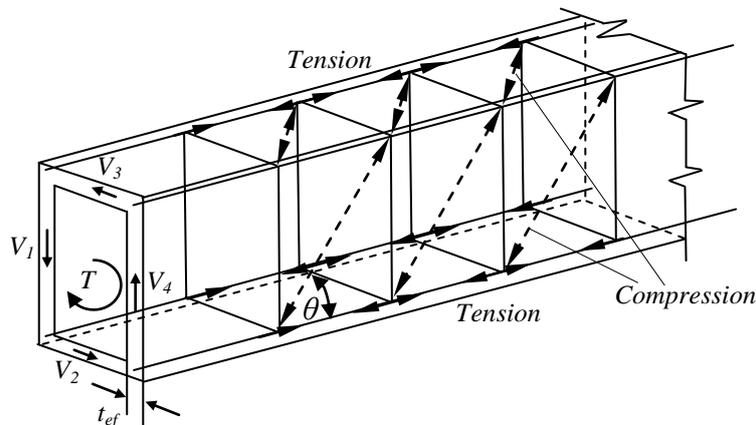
Structural model of a reinforced concrete member subjected to torsion. The figure is based on Mosley et al. (2007).
